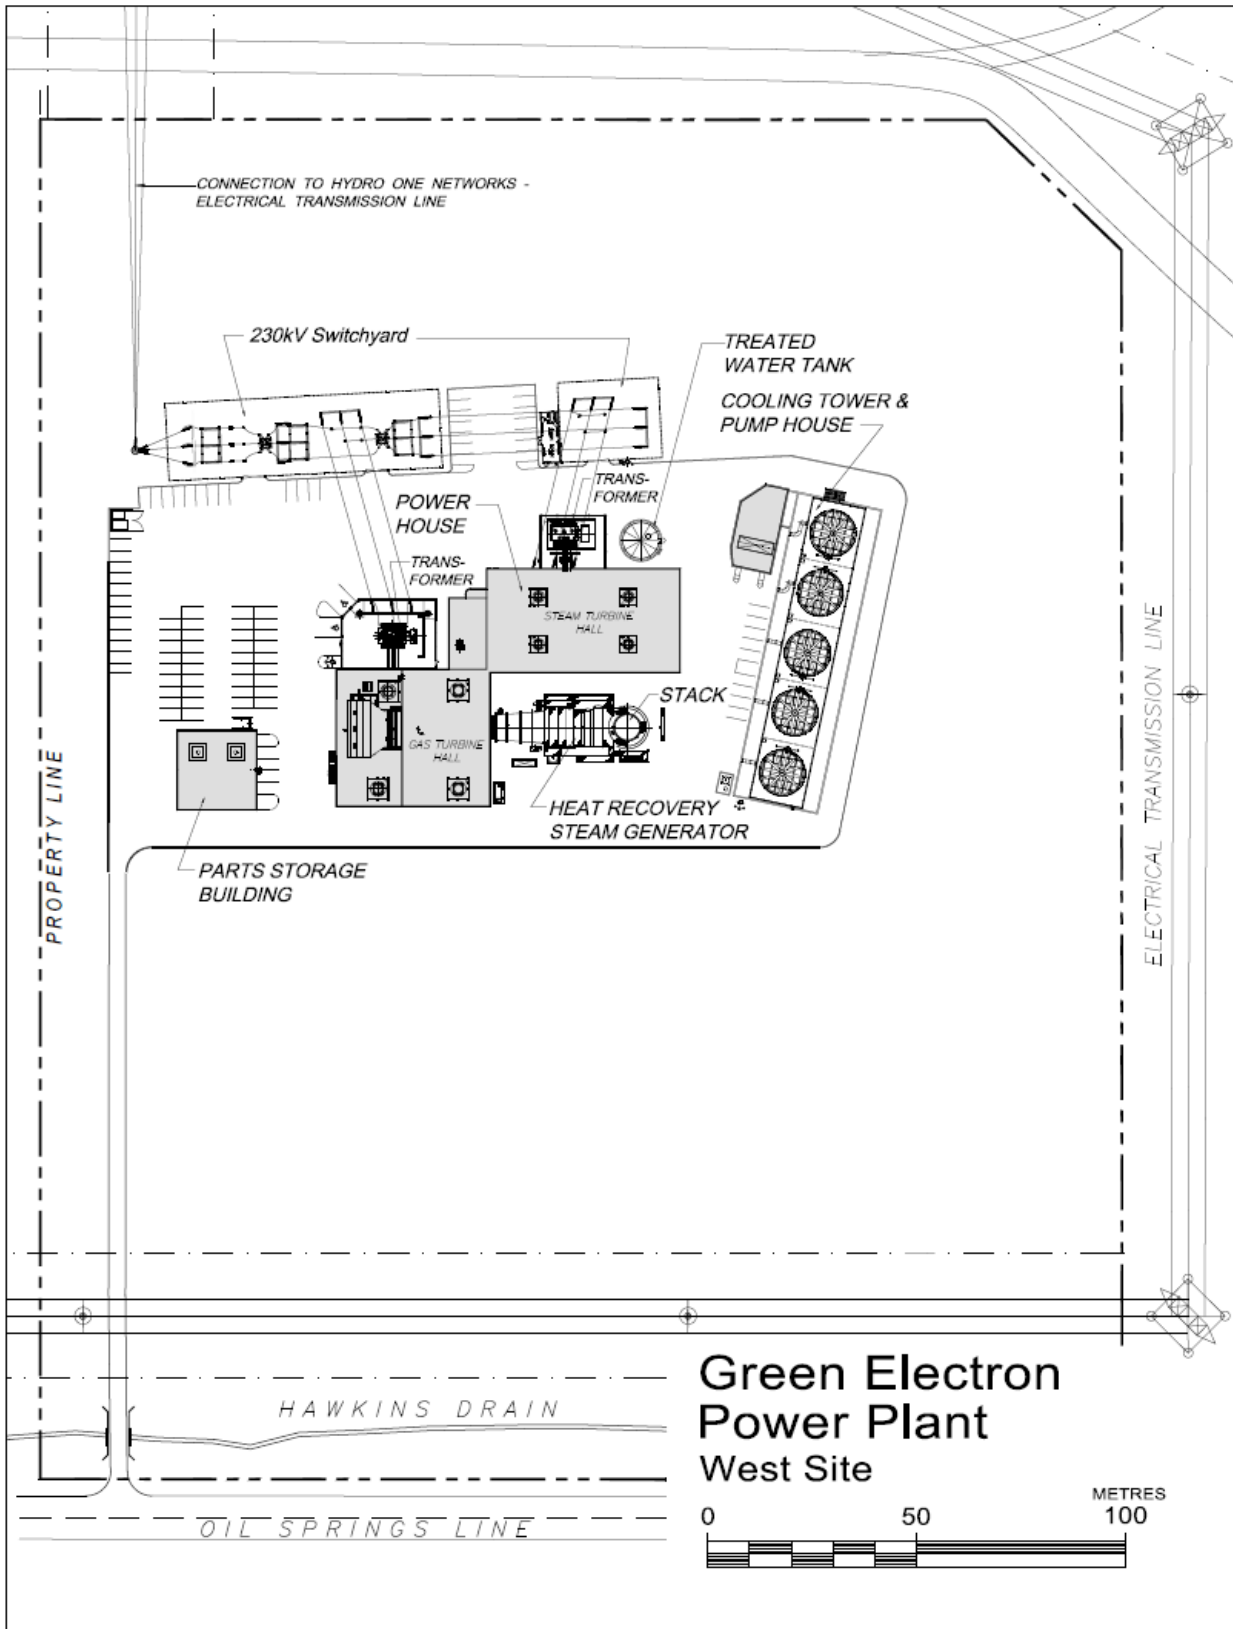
SP-W: Preliminary Site Plan West Site
